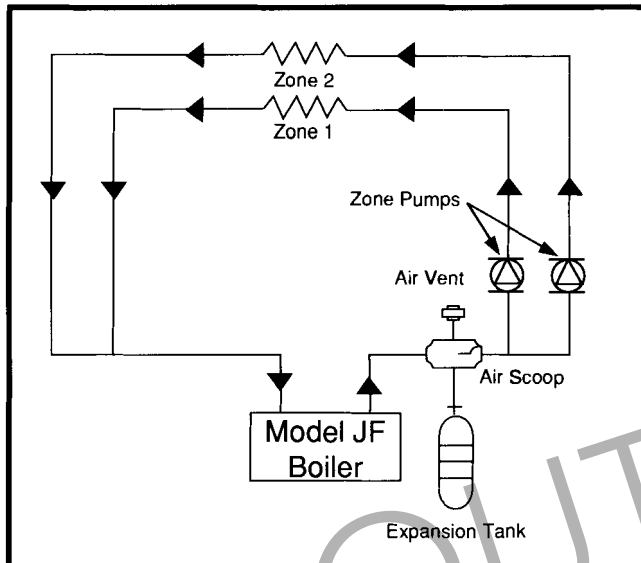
Zoned Piping System Utilizing Zone Pumps
